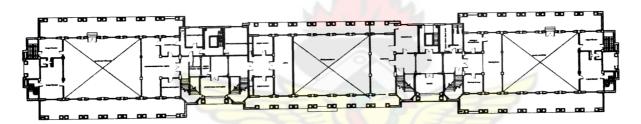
Second Floor Plan, Supreme Court Building, Ghana.
